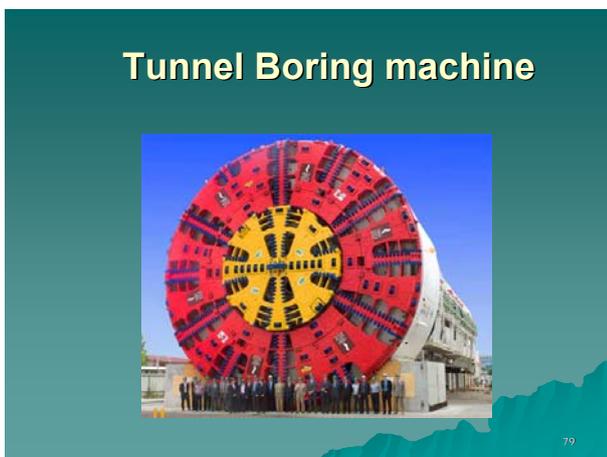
Tunnel Boring Machine for crossing Hooghly River
